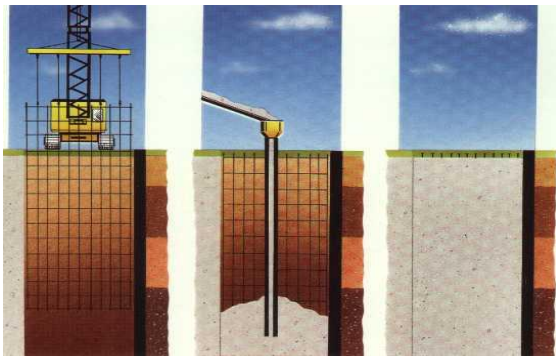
Diaphragm Wall Reinforcement & Concreteing
